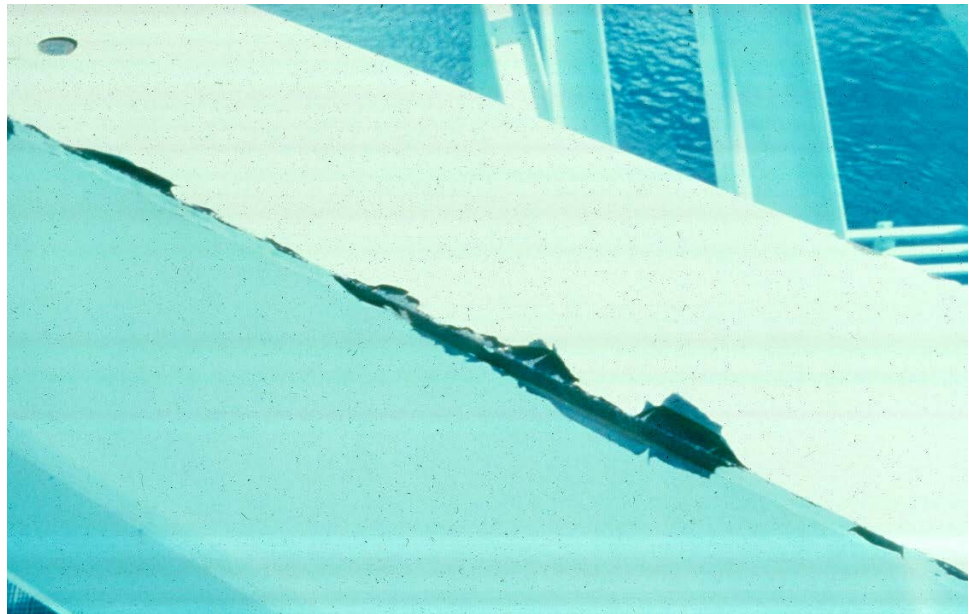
Paint Failure on Edge of Steel Truss Member
